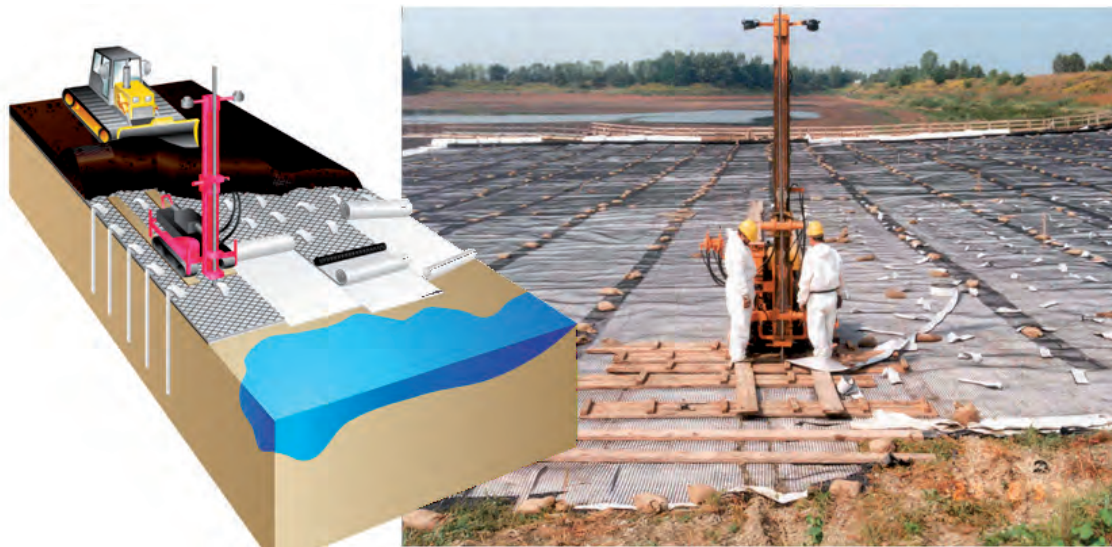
Technology used to stabilize tailings impoundments, installation of vertical drains on the Trünzig tailings pond, subsite of Seelingstädt.
